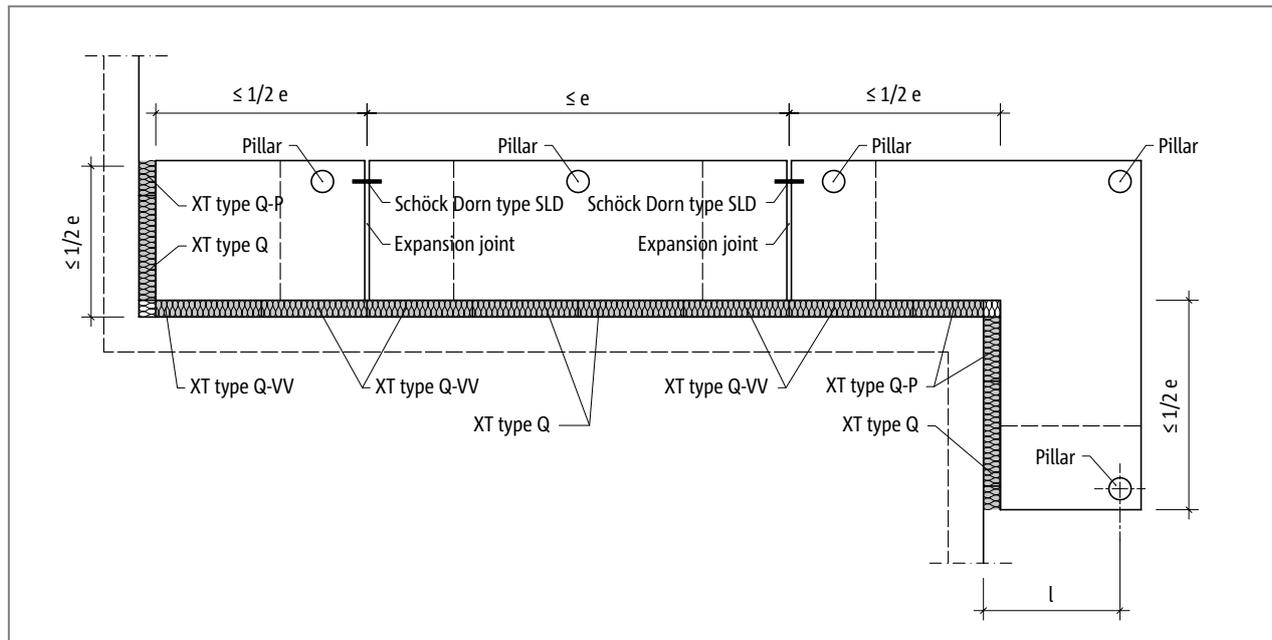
Schöck Isokorb® XT type Q-P, Q-P-VV: Expansion joint arrangement
